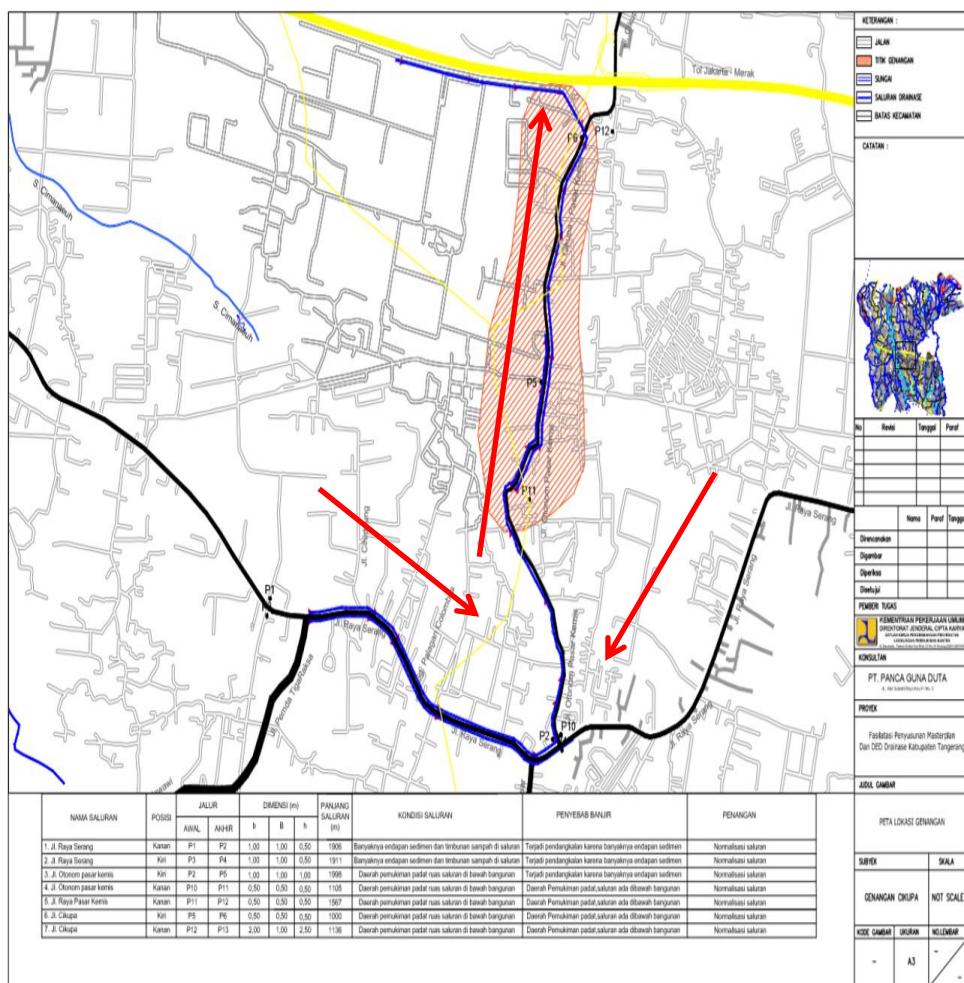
The plan view of the drainage network of Otonom Pasar Kemis Street (with slight modification from original figure) [9]
